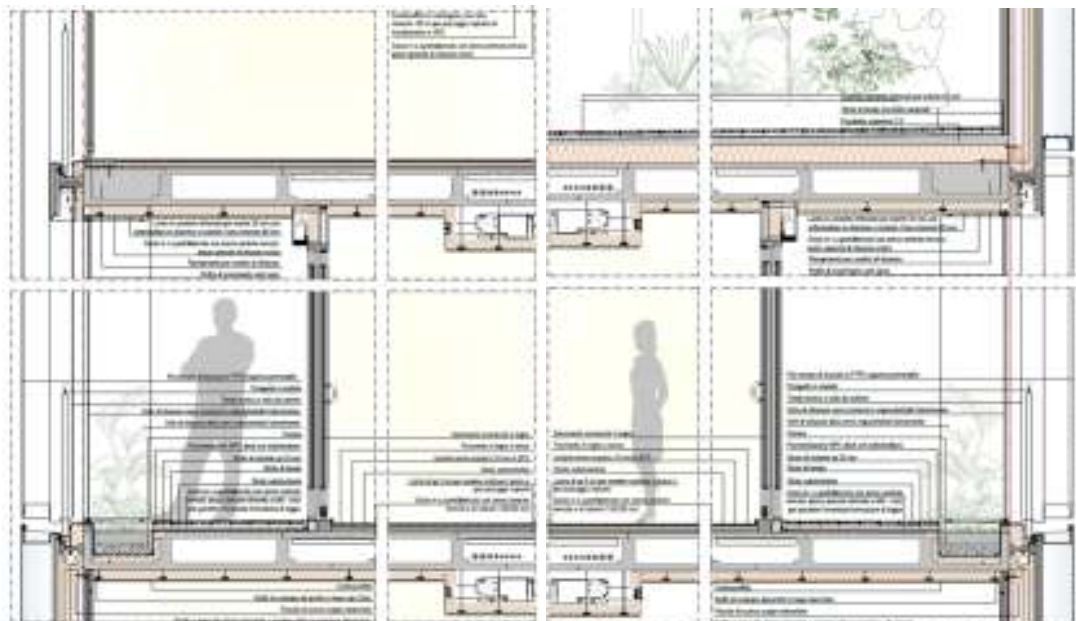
Detailed cross section of an apartment. Lightweight internal walls and prefabricated cavity concrete slab allow for flexible internal layout. External loggias offer additional spaces for the extension of apartments (© EPTA srl)
